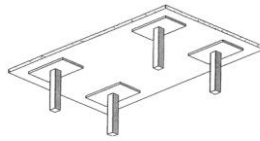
4. Flat slab supported by columns with drop panels(Fanella, A; 2011)
